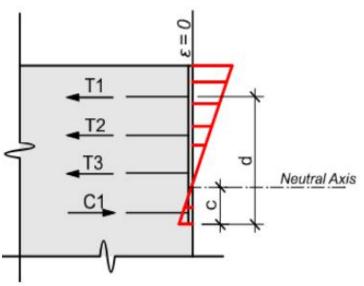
Diagram of Distribution of Forces to Welded Rebar Anchors by Dylan Thompson
